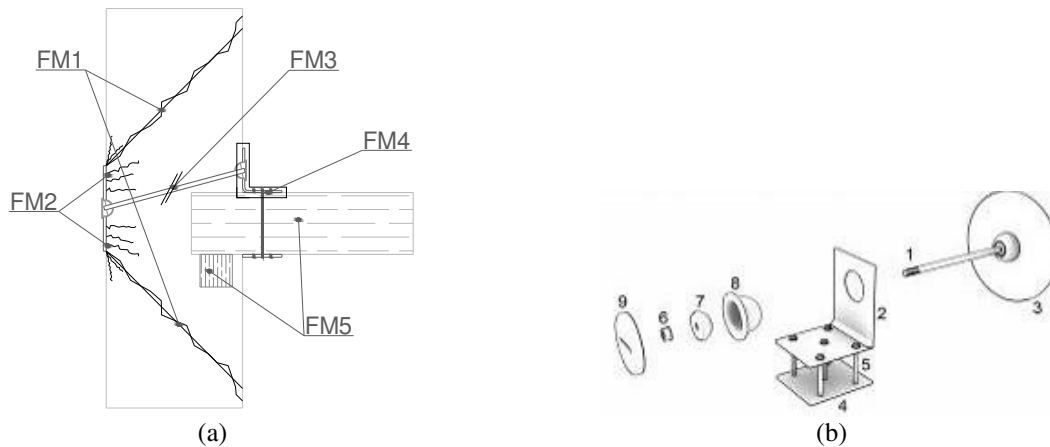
Wall-to-floor connection: (a) Expected failure modes for wall-to-floor connections; (b) adopted strengthening solution
